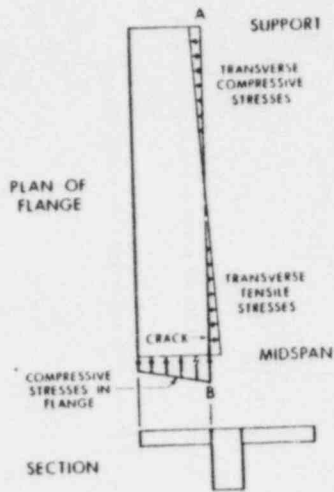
Flange Cracking in T-Beam
